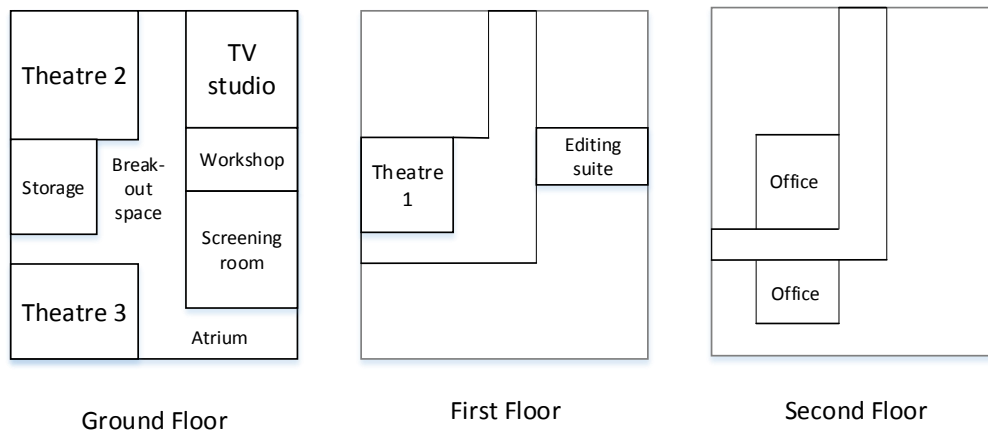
Floor plan diagrams at the end of the concept design⁴⁴
